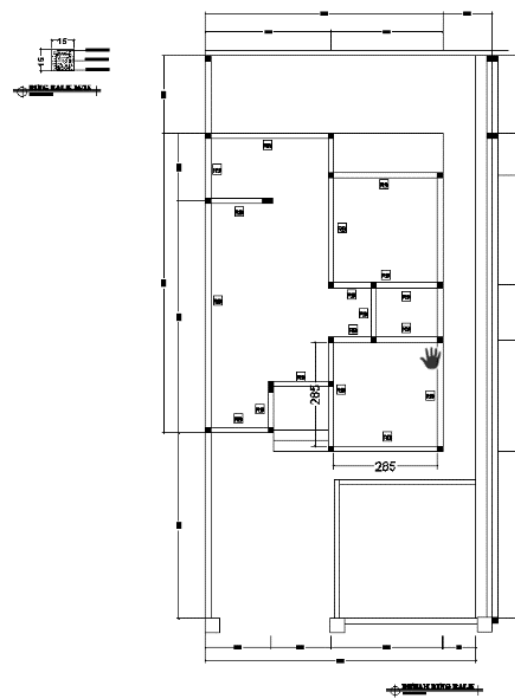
Beam Structure Plan of Official Residence, Jl. Manukan Tengah
